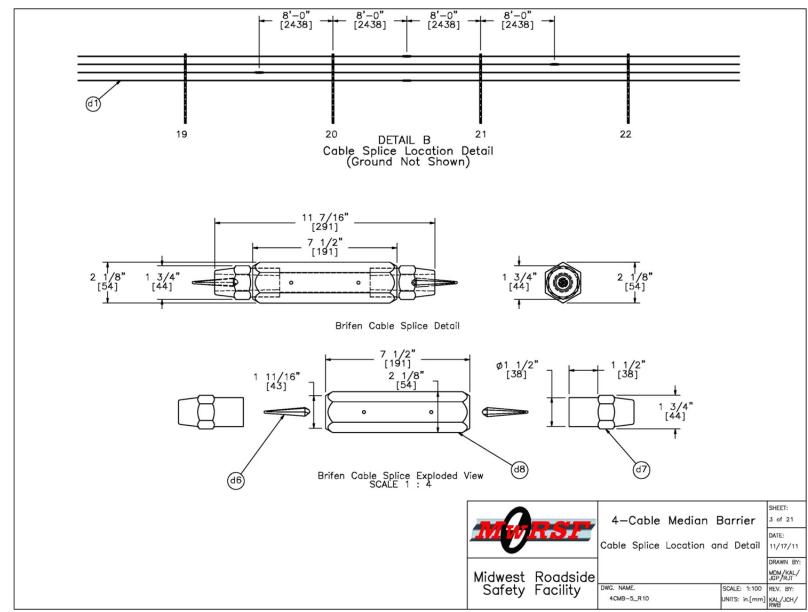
Cable Splice Layout, Test No. 4CMB-5
